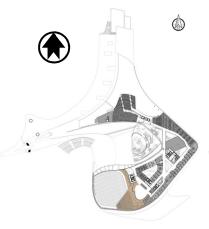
QFIS First Floor Planhttp://alfozanaward.org
